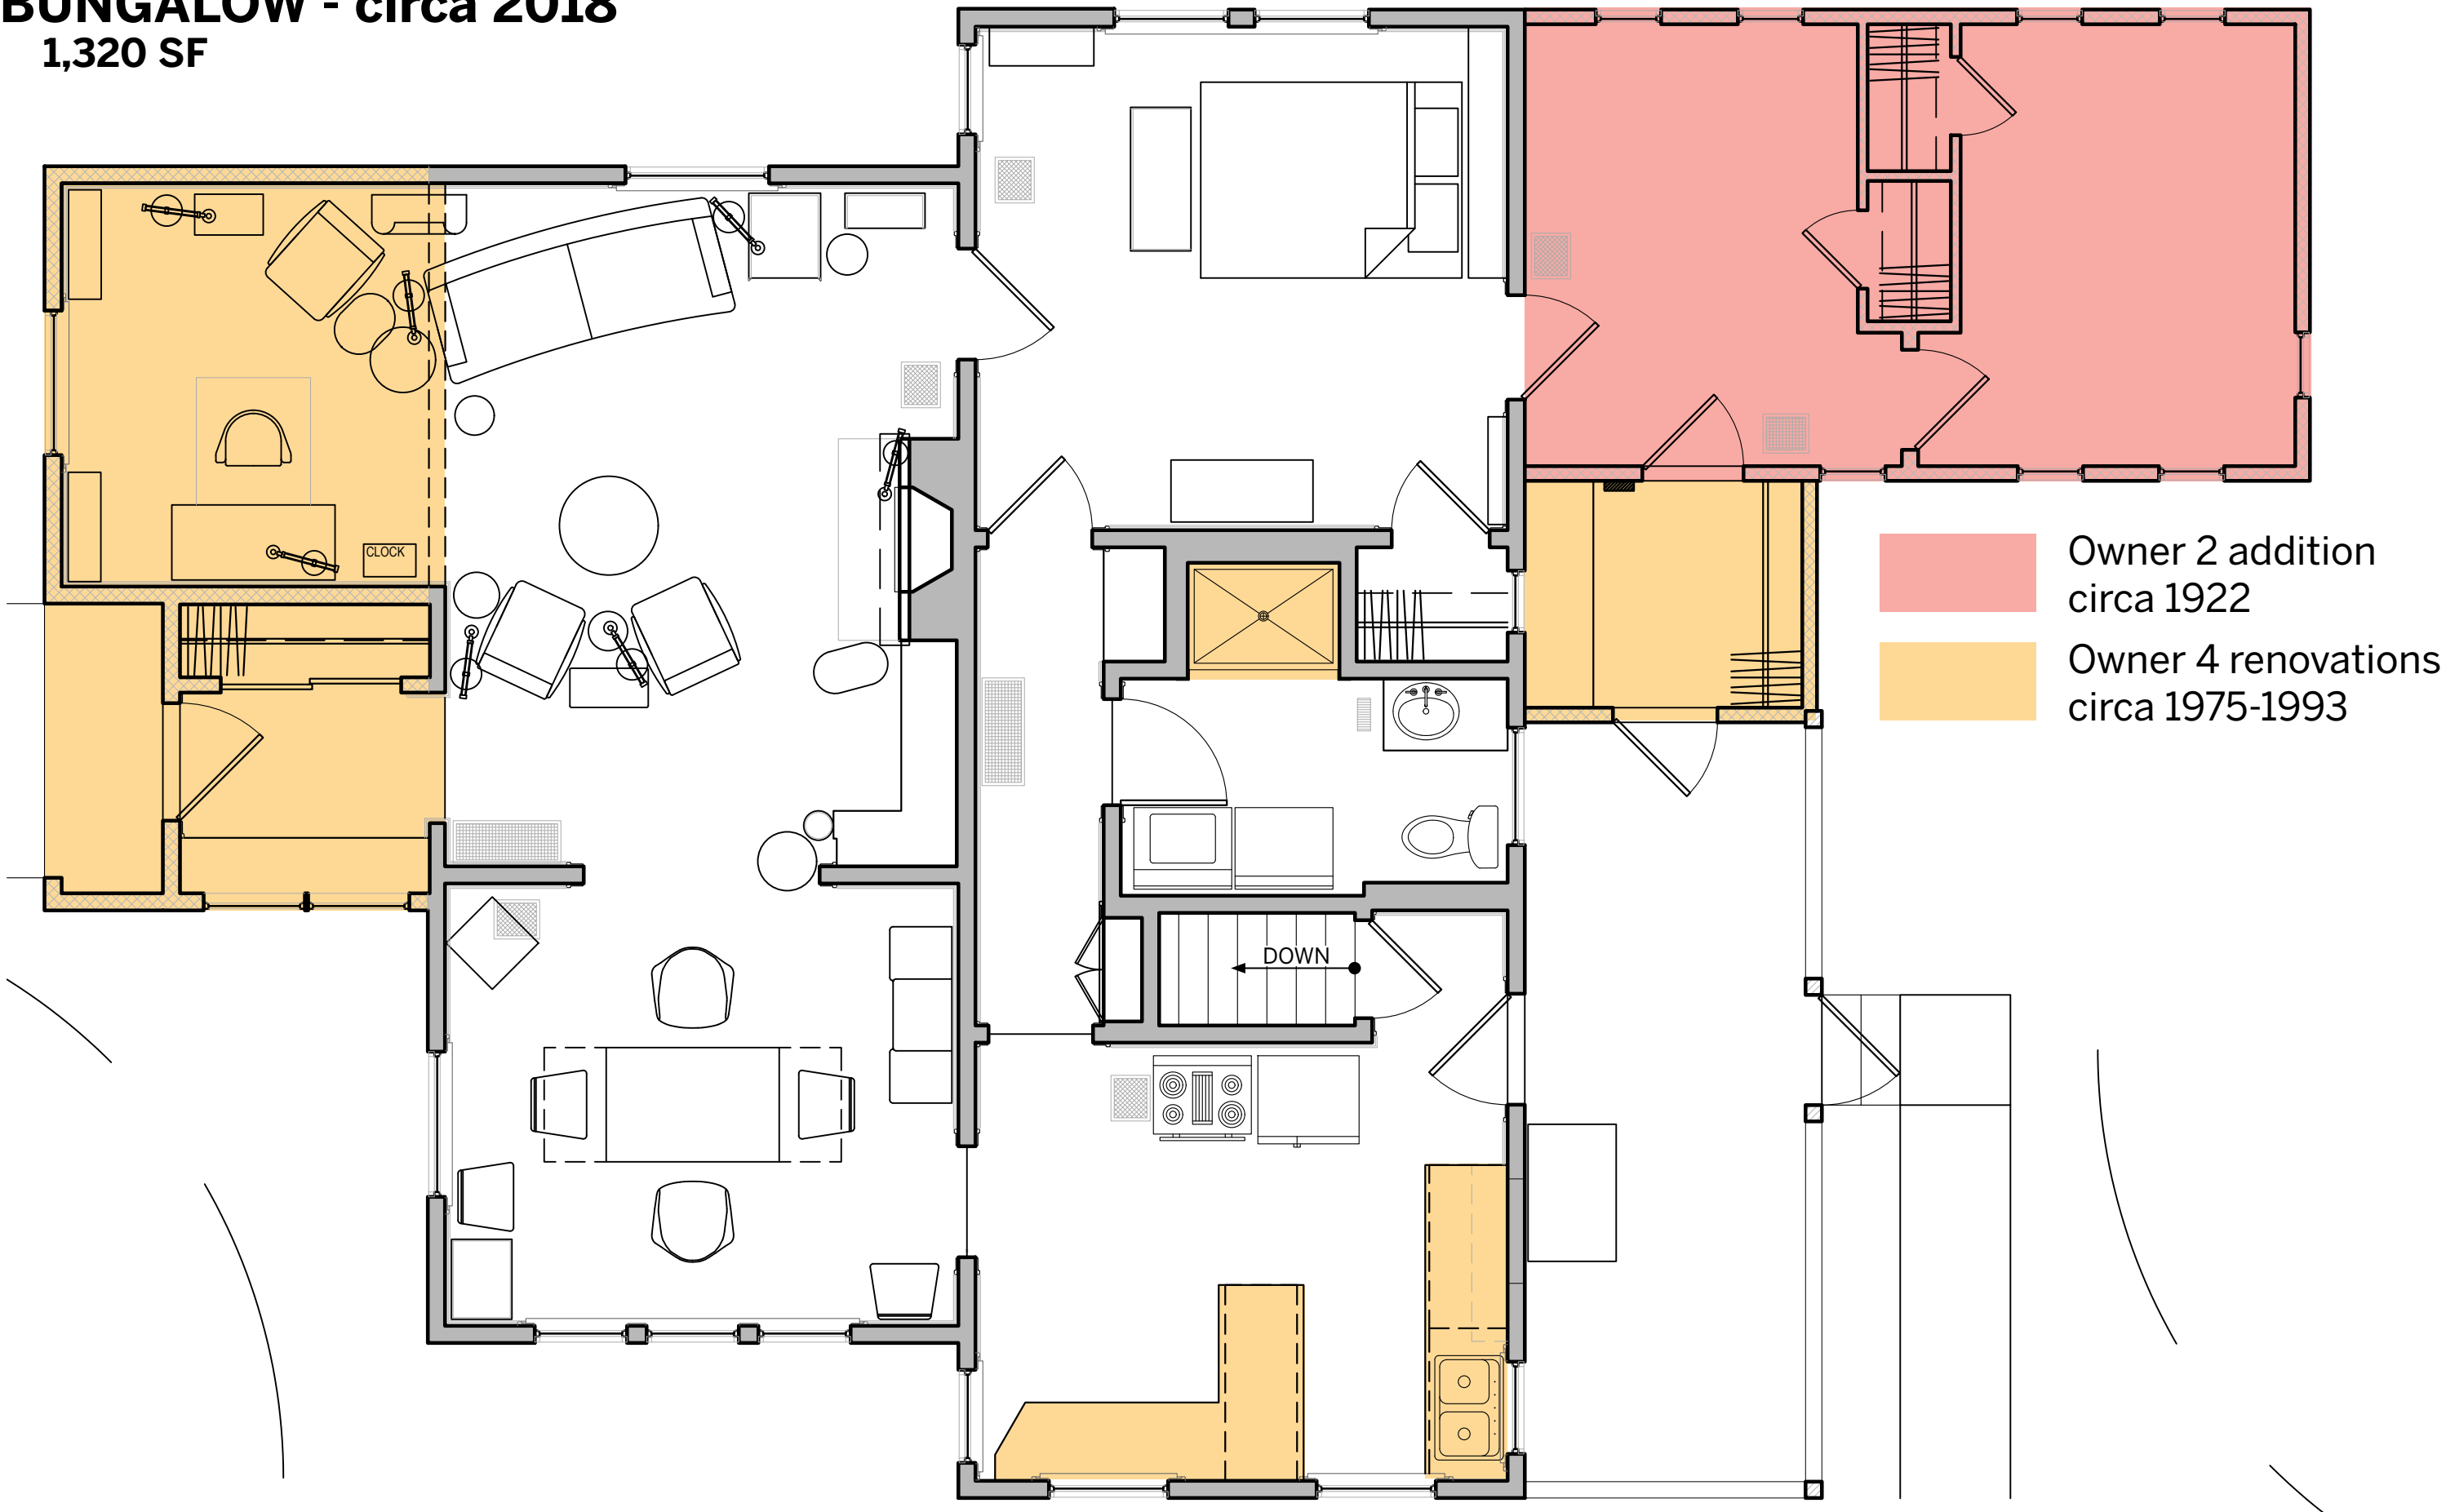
IMAGE: Floor plan of the c. 1914 bungalow in 2018, showing modifications to add two rear bedrooms, enclose the front porch, and renovate the kitchen and bathroom (drawing by author).
